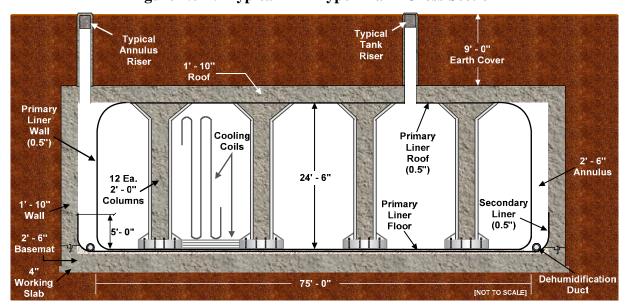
Typical FTF Type I Tank Cross Section
